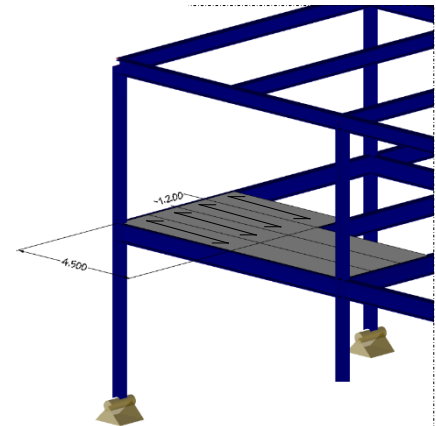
The floors slabs span 4.5 meters between the secondary beams.
